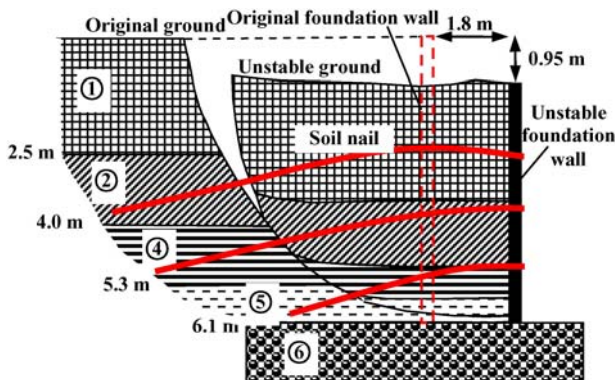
Slope failure section of foundation pit B in Kunming (G. M. Xu *et al.*, 2003)
